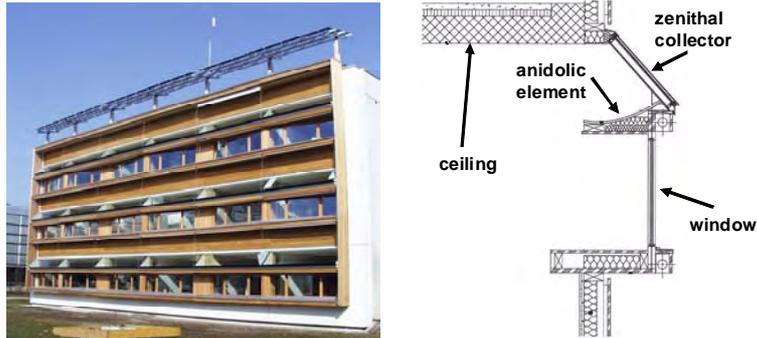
Southernfaçadeofthebuildingandacrosssectionfromthefaçade'ssystem
